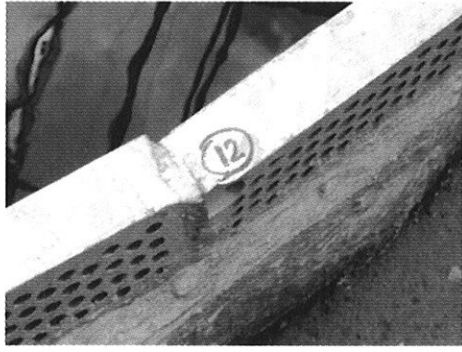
Sound proofing bricks, Fish Pond (Sample No. B/261/06/12)
